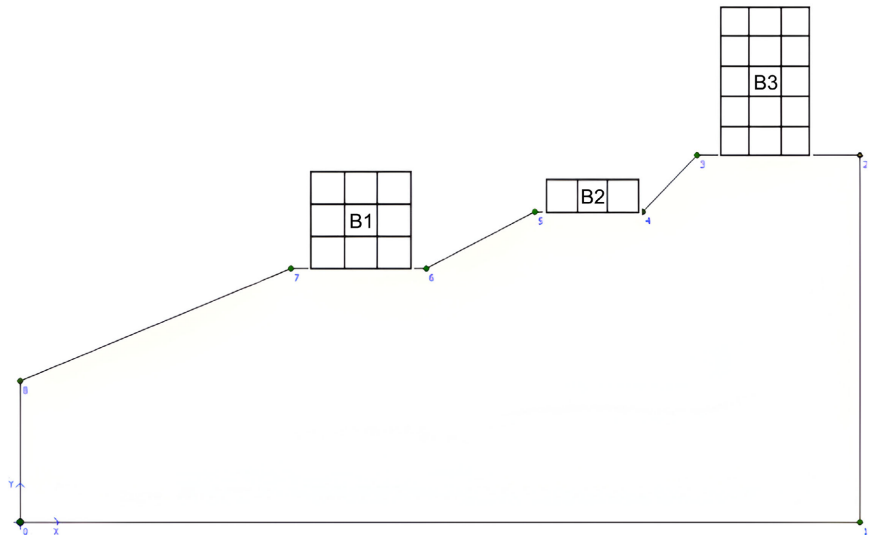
Land section plan and location of buildings in the model: loaded situation.
